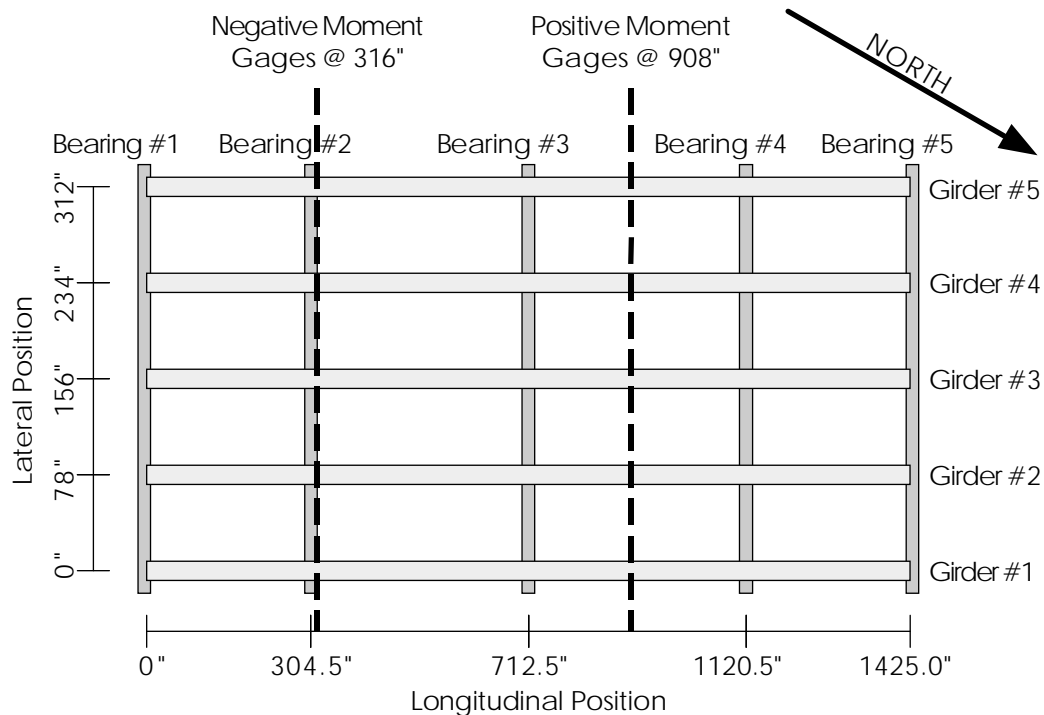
Plan View of the Girders and Bearings, Showing the Cross Sections Where Strain Instrumentation Was Placed
